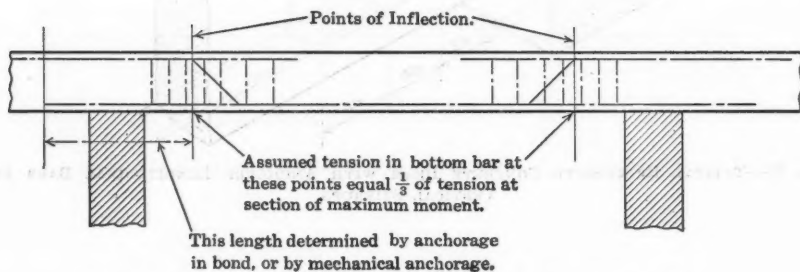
TYPICAL WEB REINFORCEMENT FOR CONTINUOUS BEAMS.
